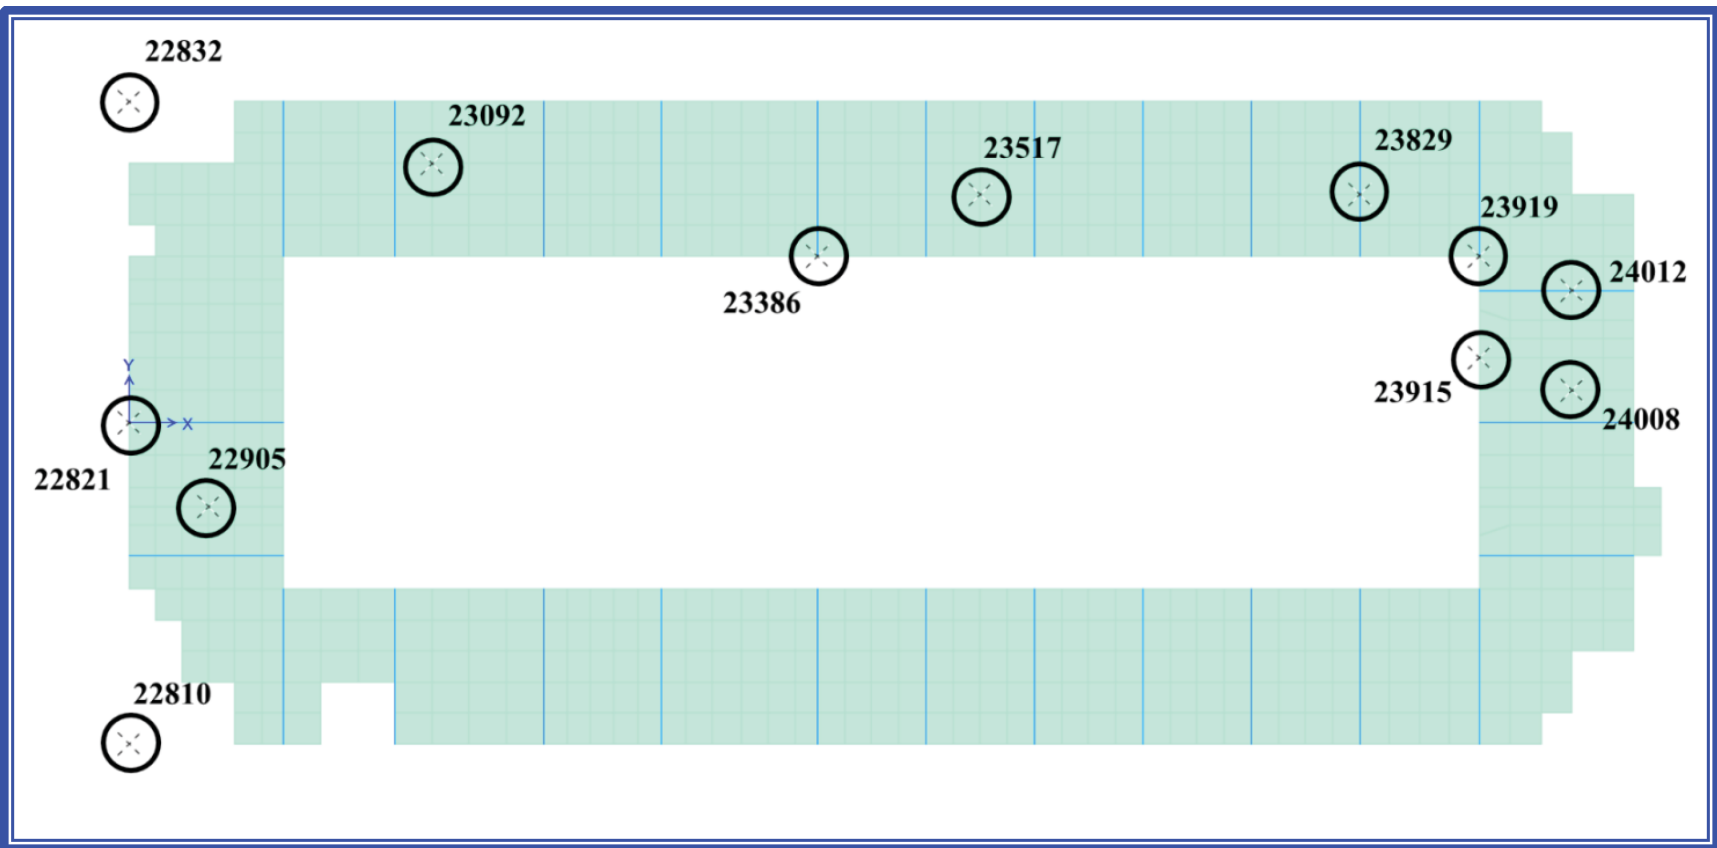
Floor ISRS Locations at TOC EL 126'-0"
